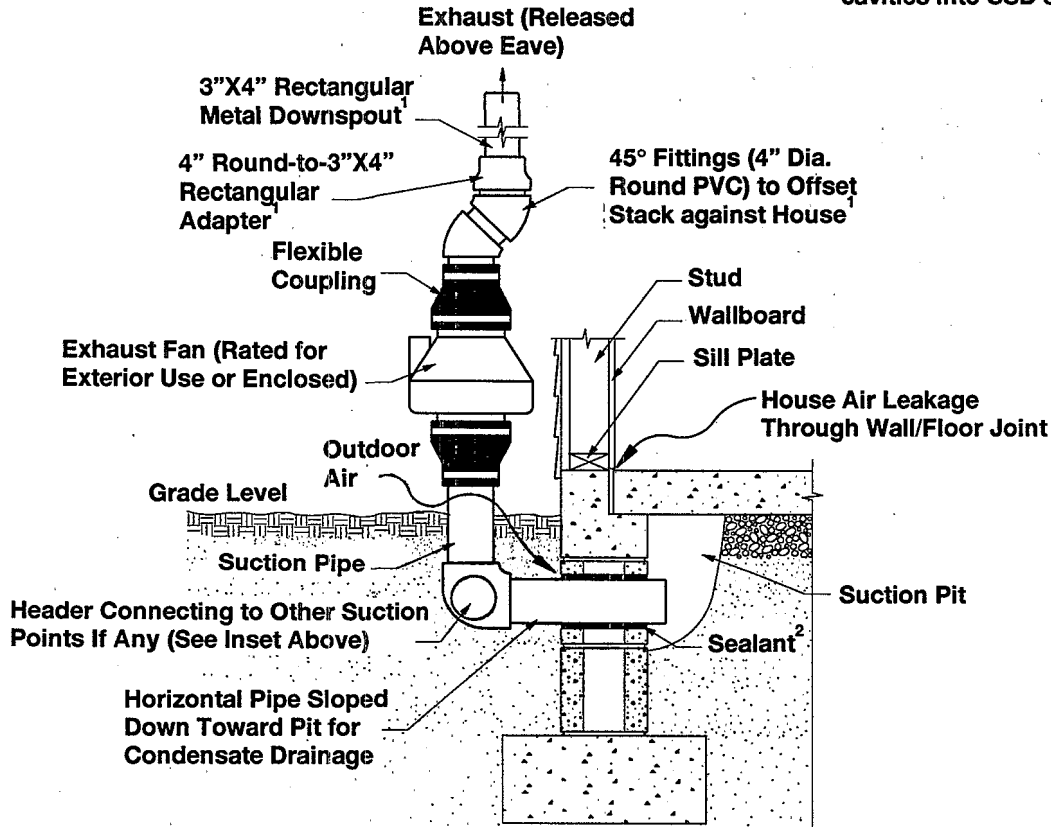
Sub-slab depressurization (SSD) using pipes inserted horizontally through the foundation wall from outdoors.
